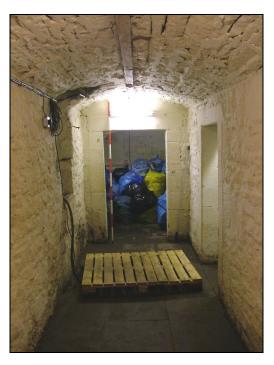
View looking north-east of cellar below mansion house, note the stone walls and door surrounds, stone flagged floor and brick vaulting (Scale = 2m)
